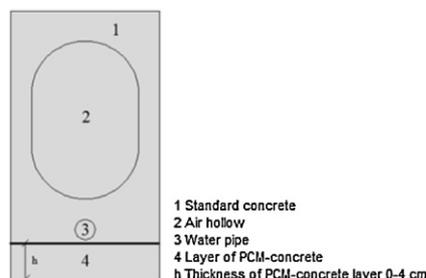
Section of the hollow core concrete deck element with TABS and PCM.
